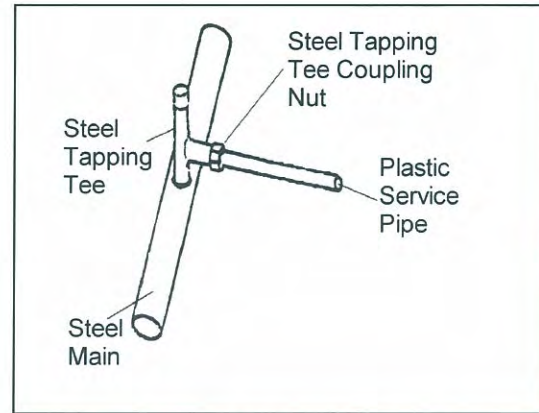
Typical plastic service pipe connection to steel gas main. Many connections are protected against shear and bending forces by a plastic sleeve that encloses the service pipe-to-tee connection on either side of the coupling nut.
